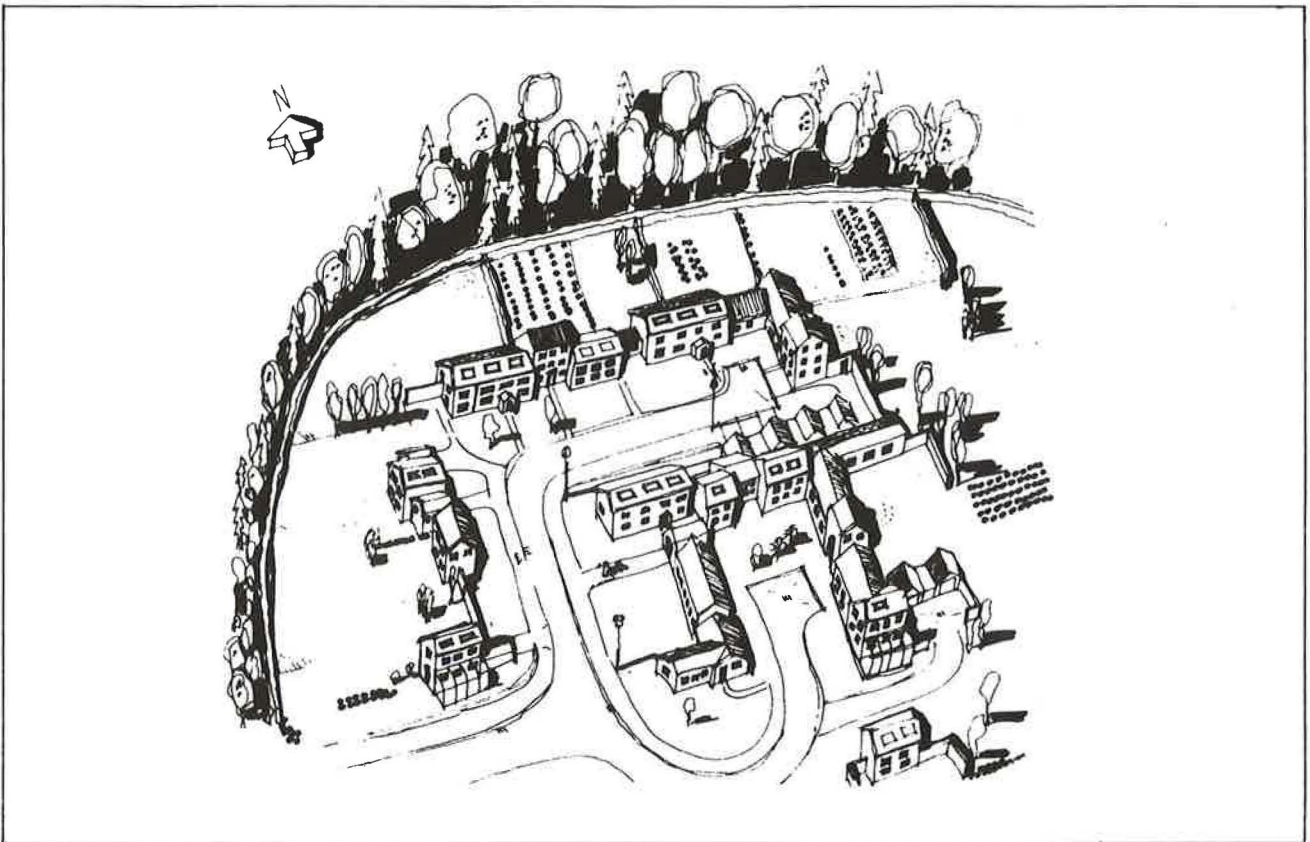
A site design providing substantial tree shelter to north, with good solar access to buildings and spaces
